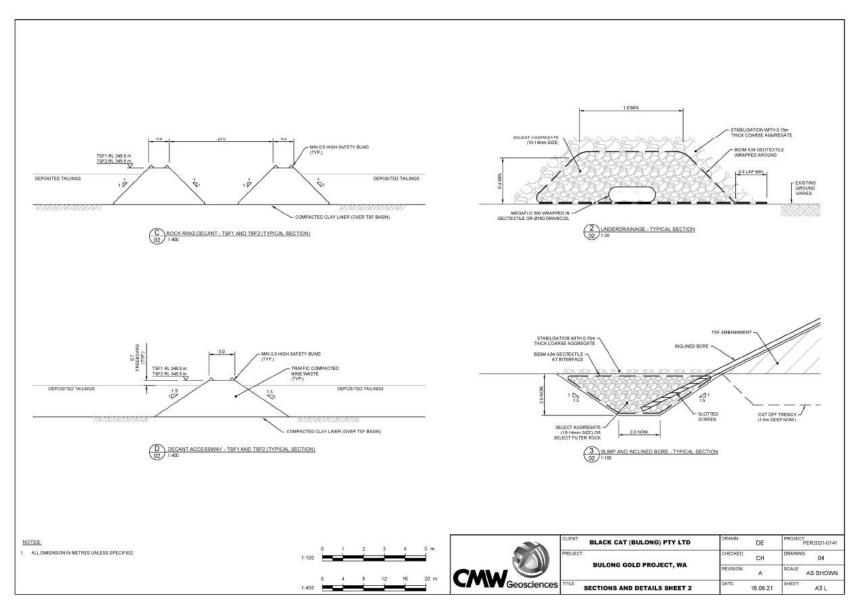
TSF (cells 1 and 2) - sections and details sheet - PER2021-0141-04)
